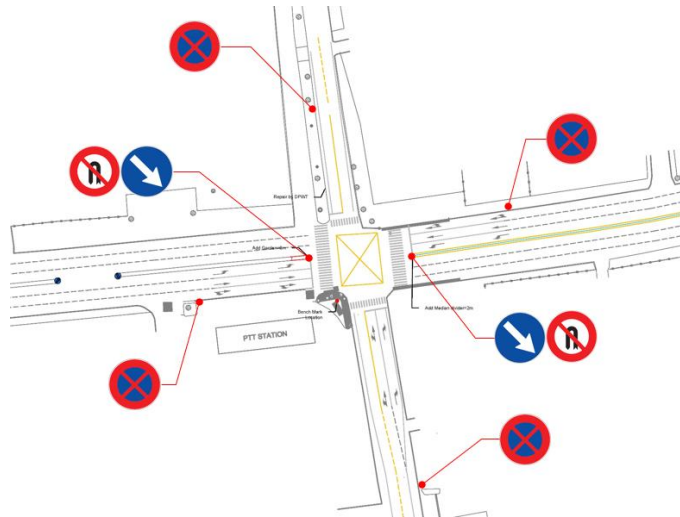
Examples of the Installation of Traffic Signs at Intersection #167
